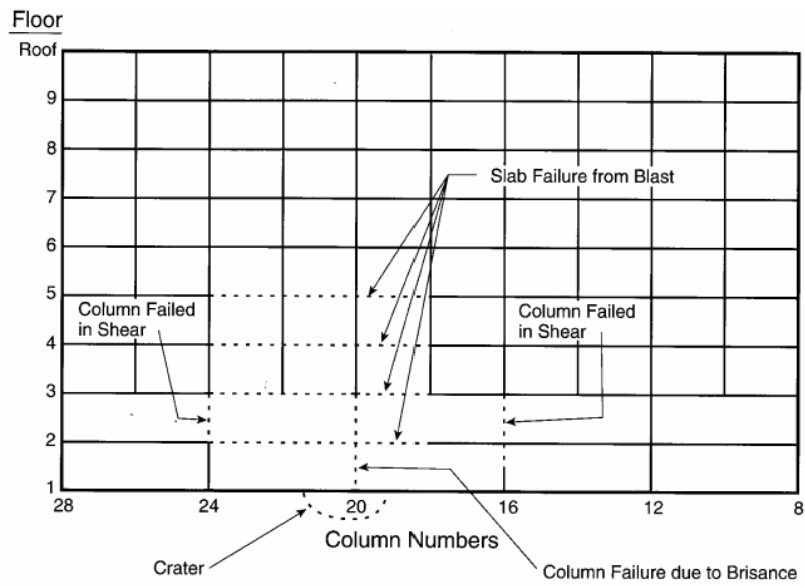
The destroyed elements of the building (Marchand, 2004)
